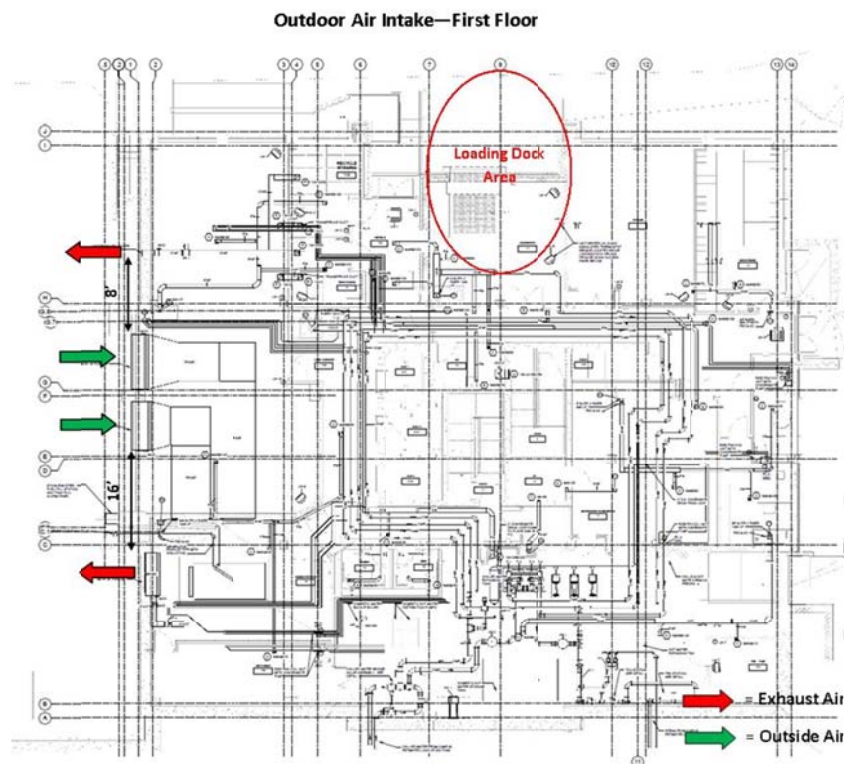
Floor plan of first floor showing OA inlet and EA outlet locations
